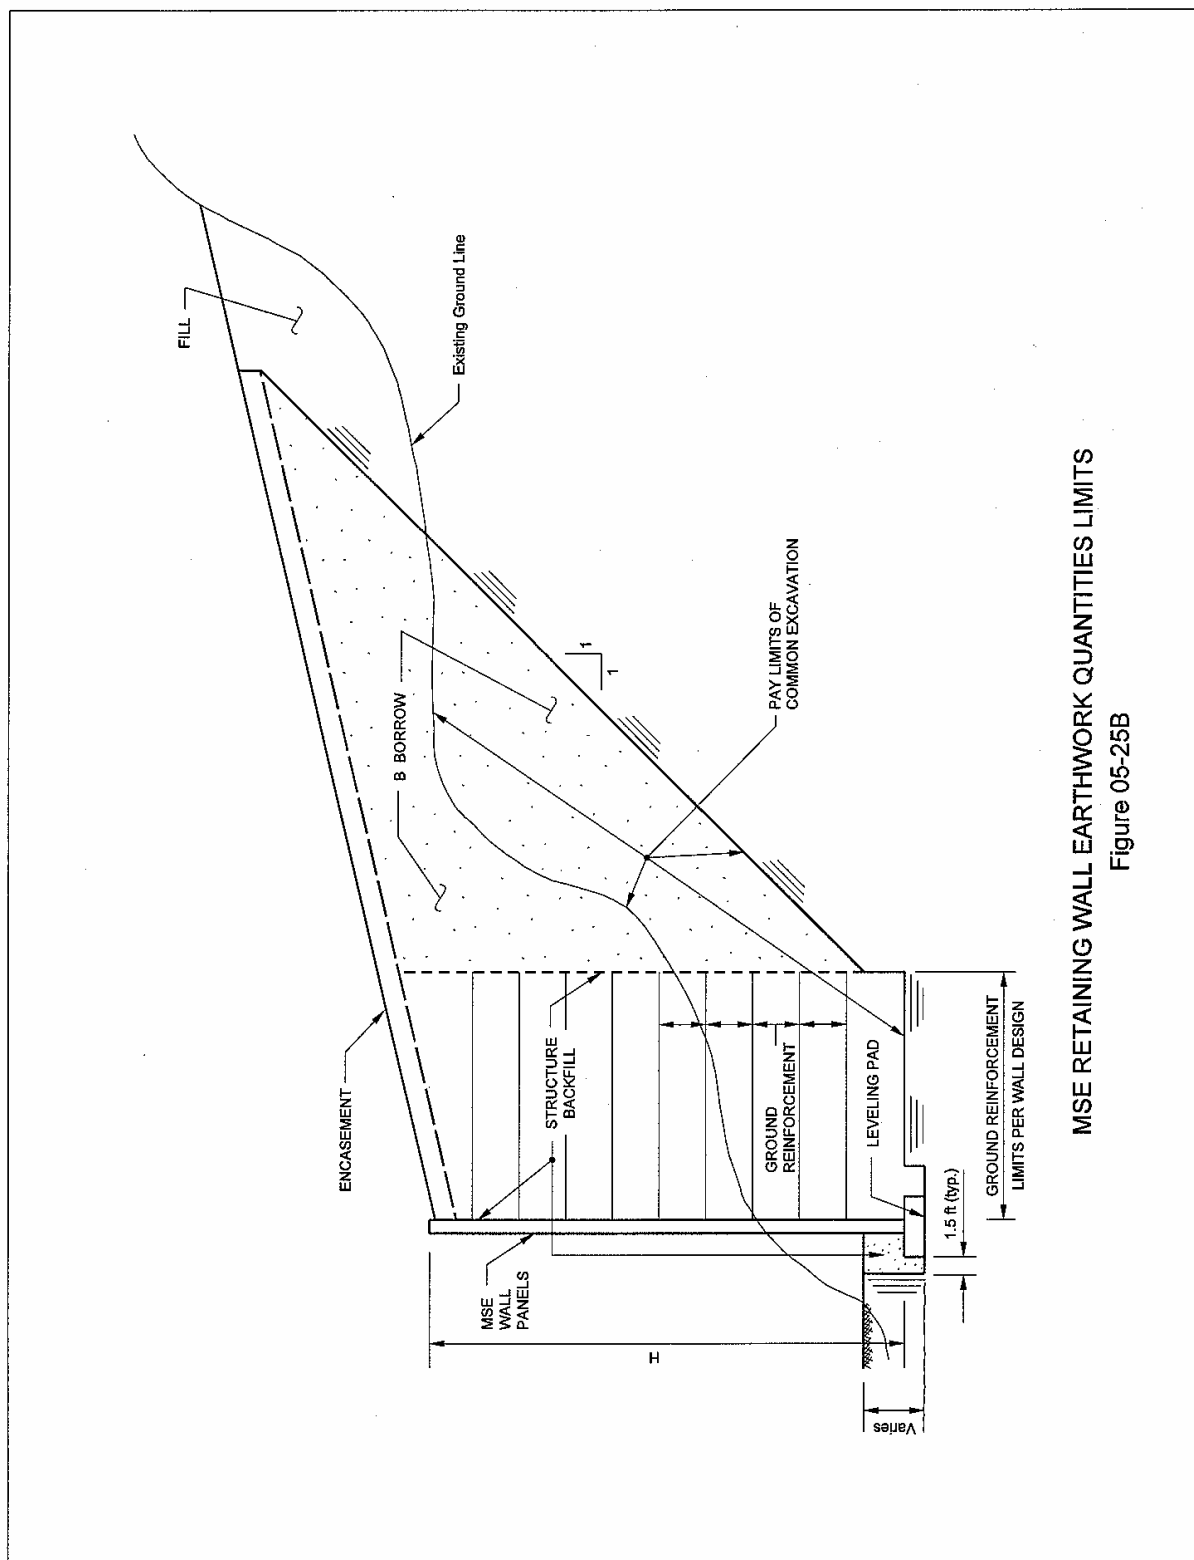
B, Cast-in-Place Concrete Retaining Wall Earthwork Quantities Limits; Figure 17-4C, MSE Retaining Wall Earthwork Quantities Limits; and Figure 17-4D, MSE Retaining Wall Earthwork Quantities Limits Showing Foundation Treatment, each illustrate the typical pay limits for excavation and backfill material quantities for retaining walls. The contractor may select an alternate wall design. However, the earthwork quantities should be calculated based on the outermost neat-line construction limits for the wall type shown on the plans.
